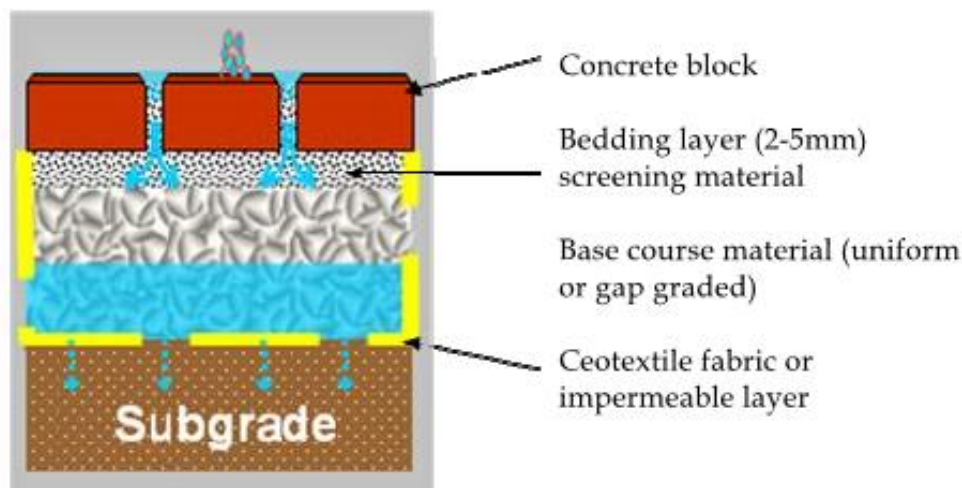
Example section of permeable pavement (concrete block with no underdrains)
